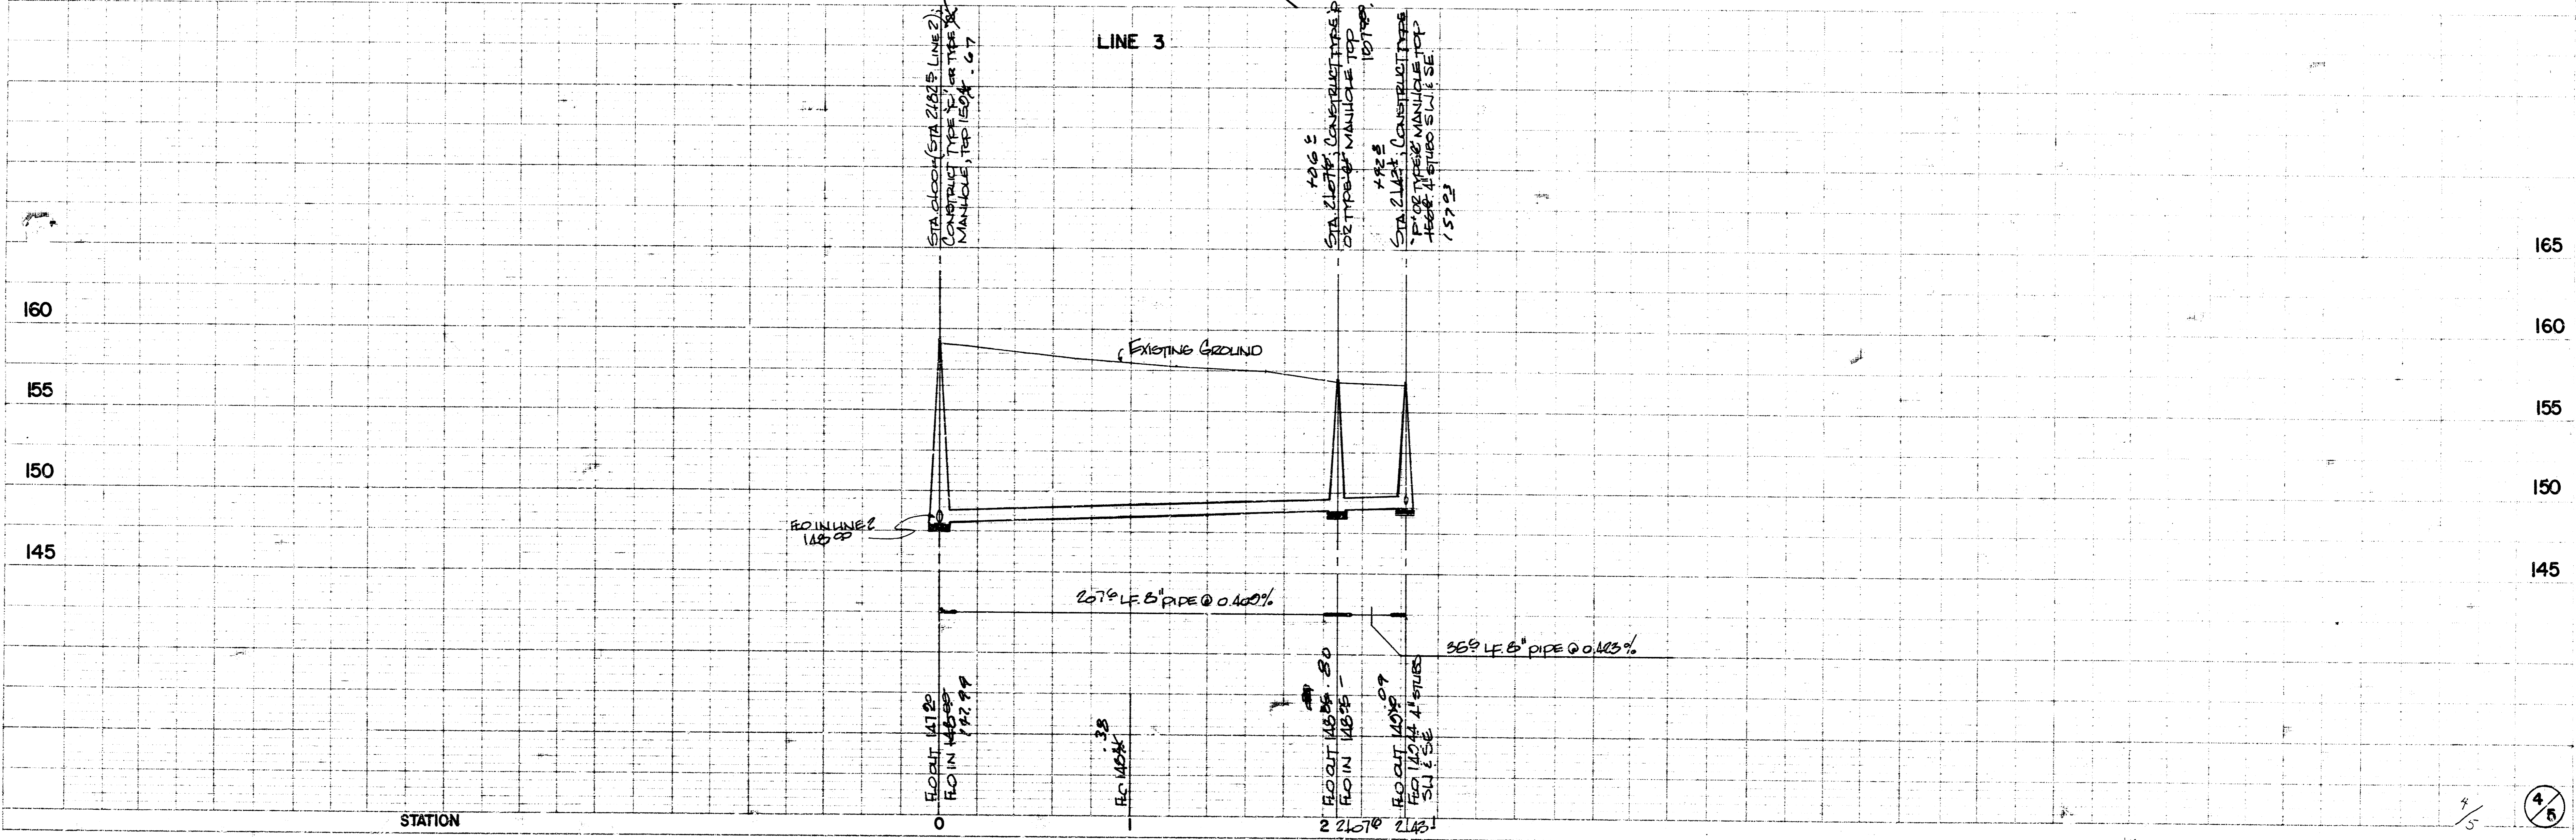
SINGLE PLAN AND PROFILE-FULL LINE
